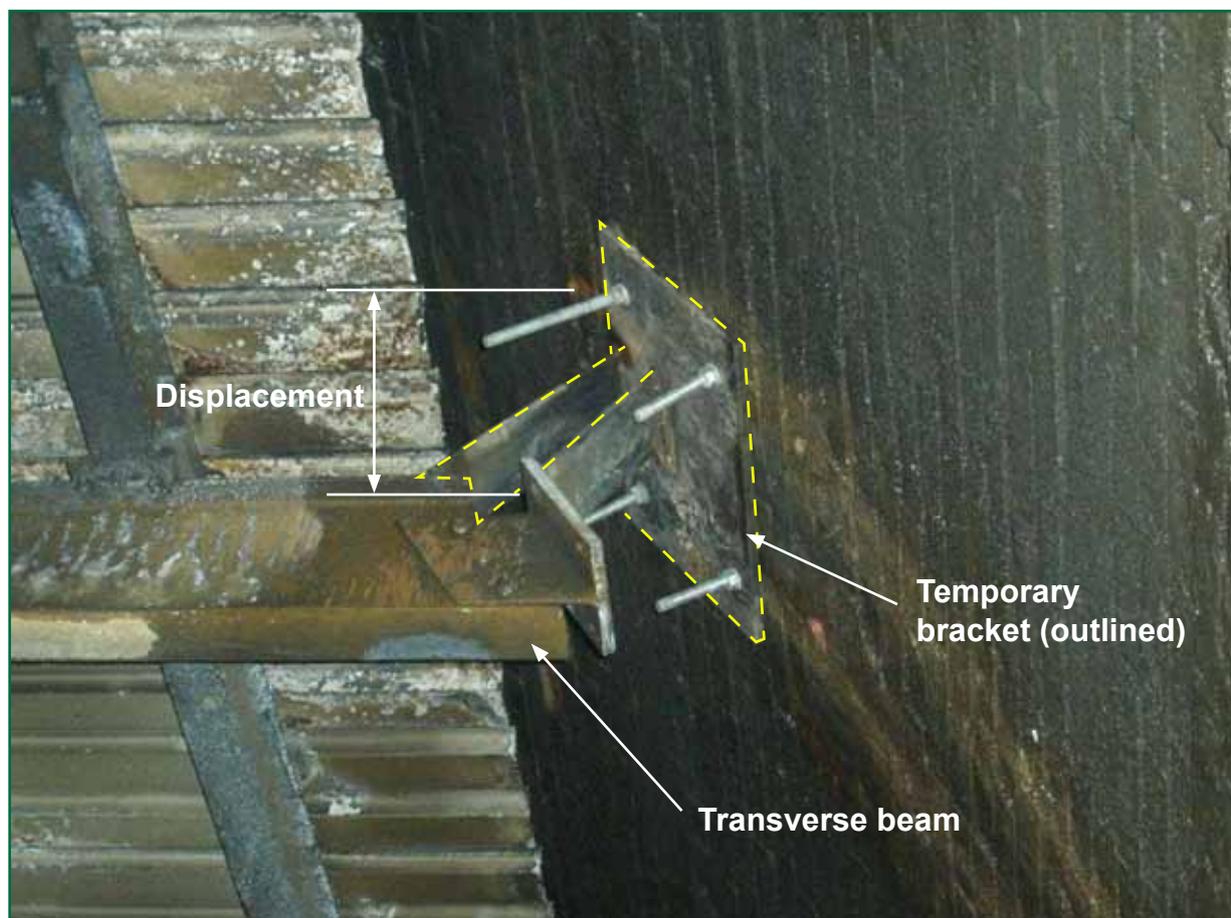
Temporary bracket supporting end of detached transverse beam 16
